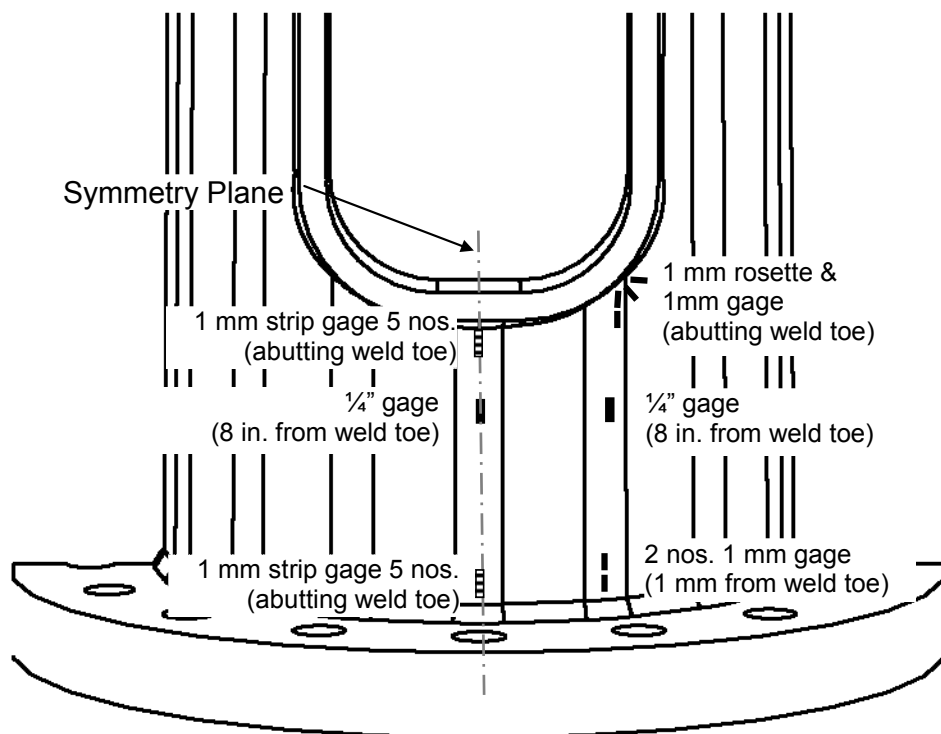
Strain gauge layout in specimen Type X near pole base and hand hole
